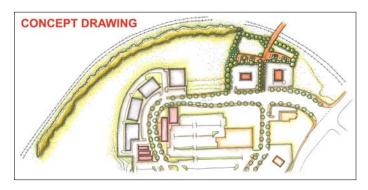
Concept drawing showing possible park at foot bridge and tree buffer along railroad
